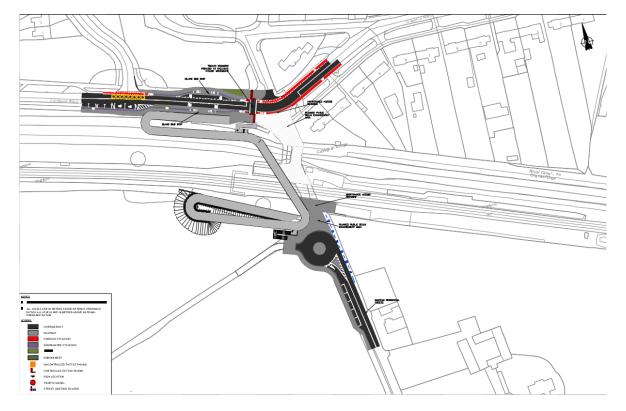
Clonsilla Level Crossing Proposed Layout
